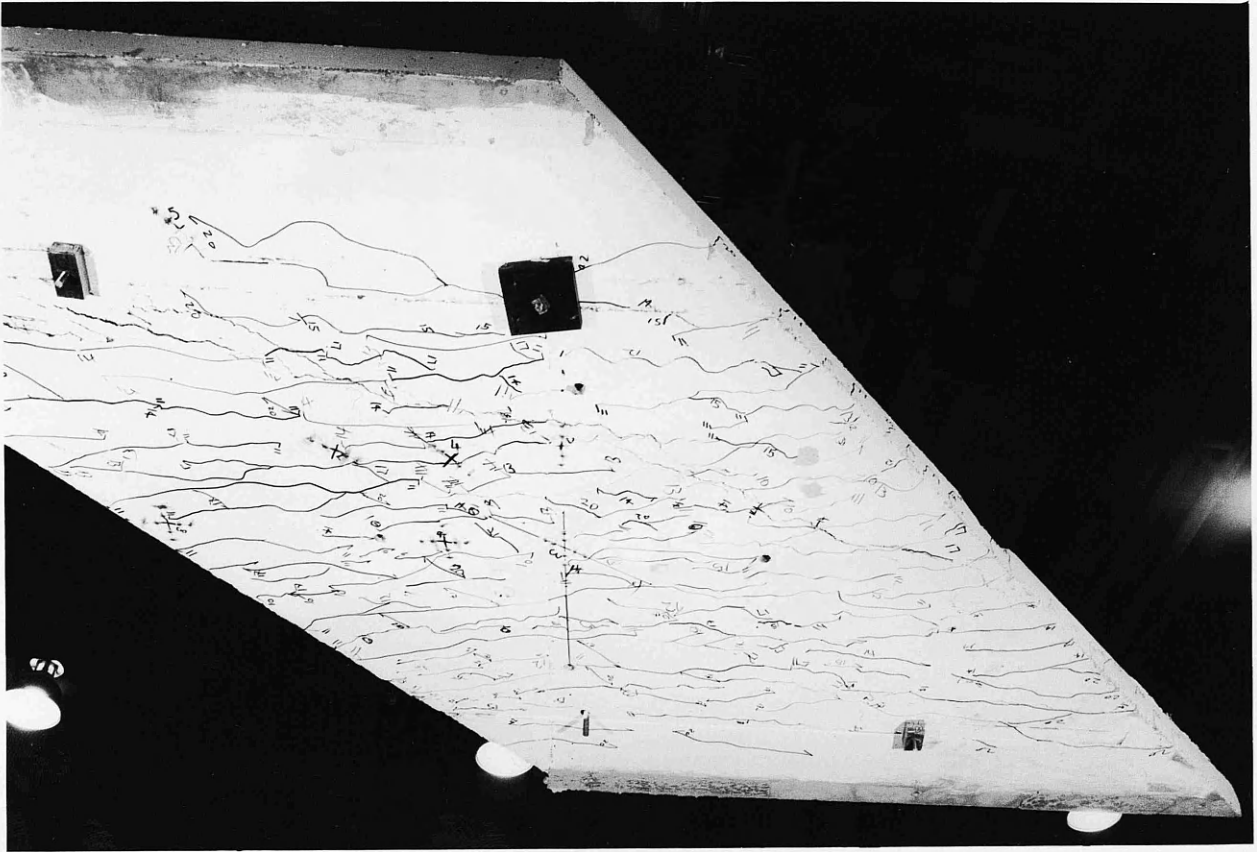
MODEL SKEW SLAB NO. (2) Soffit crack pattern to failure
